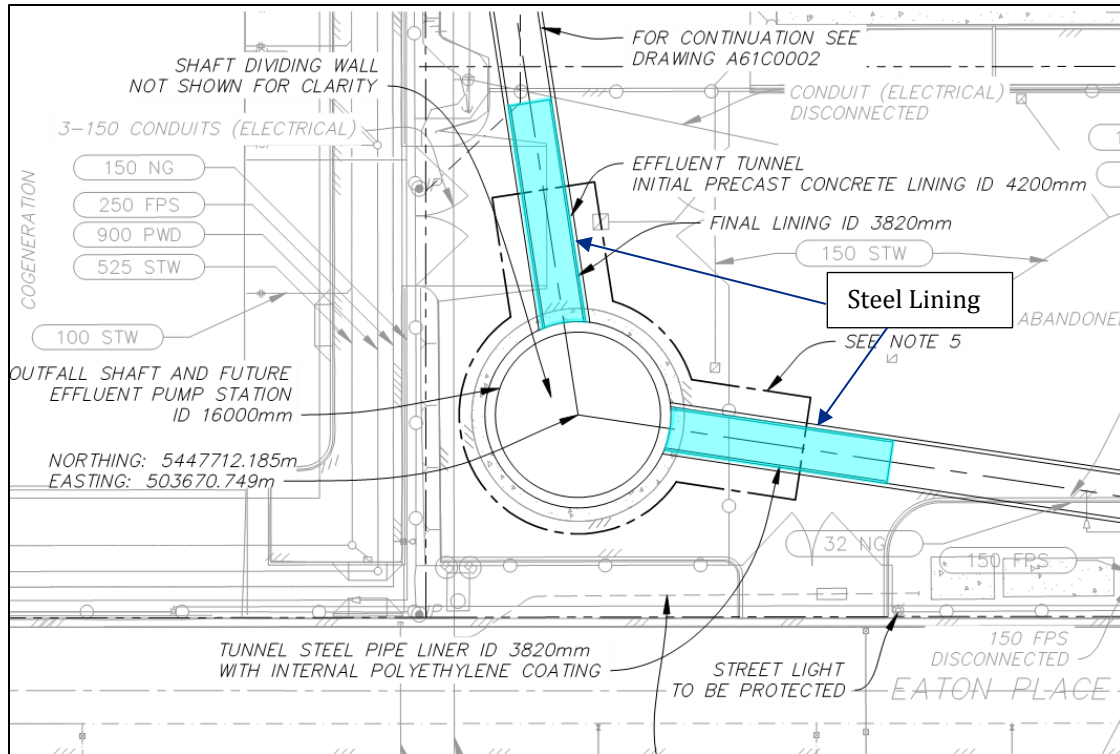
Outfall Shaft Tunnel Steel Liner Plan View (Drawing Number A61C0003)
